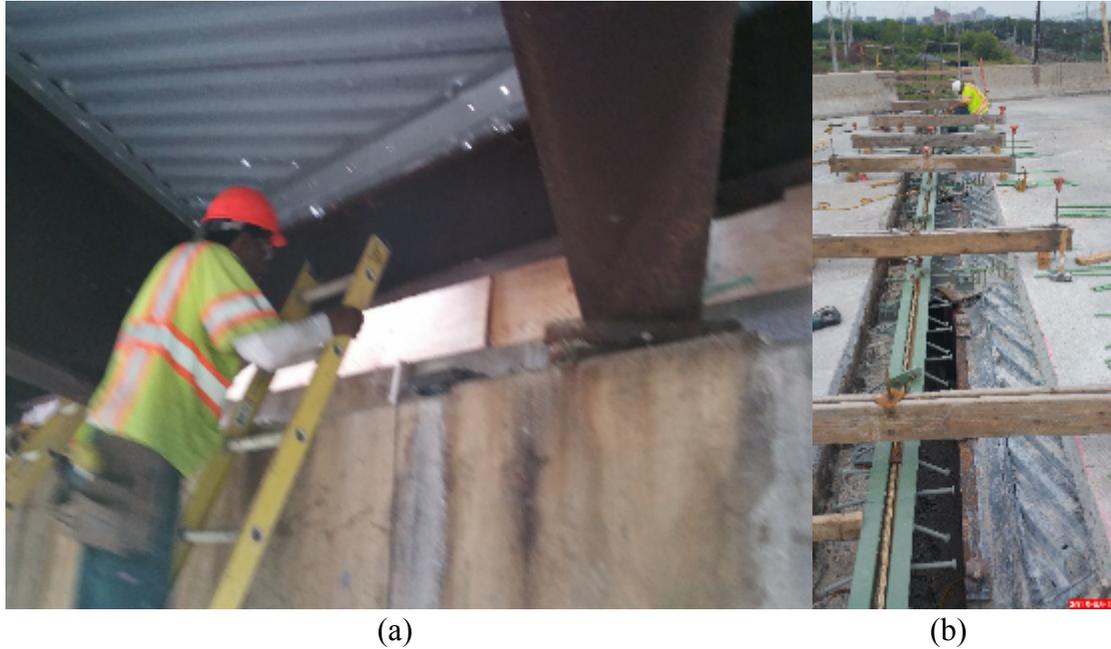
The Implementation of the Wooden Formwork for the Backwall Along the Length of the Dam, Formwork (a) Nailed into the Abutment, Underneath the Bridge from the Catwalk and (b) Inbetween the Armoring
